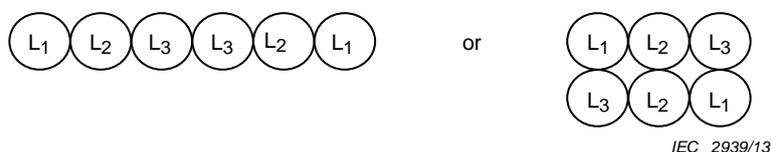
Recommended arrangement for installation of single core cables – flat configuration
